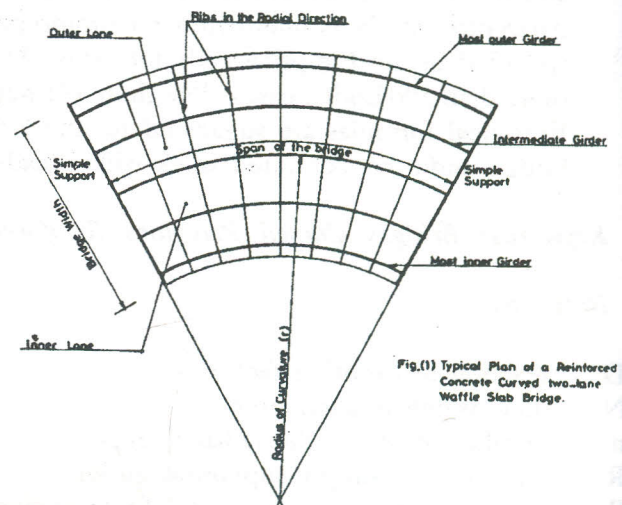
Typical plan of a reinforced concrete curved two-lane waffle slab bridge.
